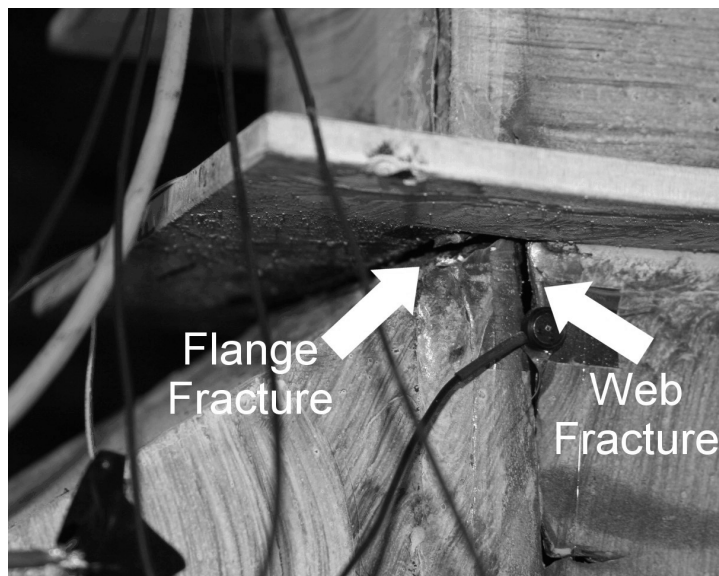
Close-up of Flange and Web Fracture of Specimen X2L1.6
